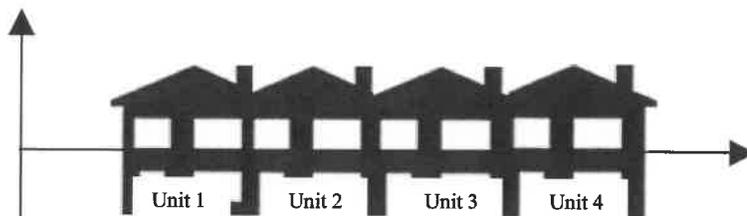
H: Linear Multi-Family Dwelling Arrangement
